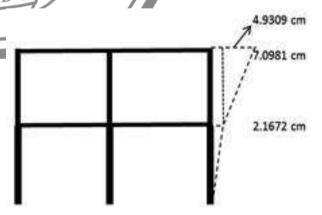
Sway mode due to earthquake load acting on the frame structure of coconut-timber house (generated with ETABS)
